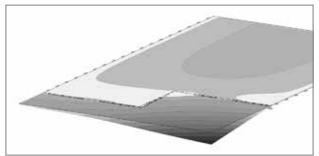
Schöck Isokorb® T type K-E, K-T: 3D view of floor and balcony deformations
